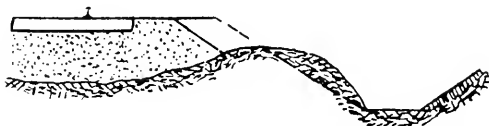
FIG. B—CROSS-SECTION SHOWING DISTORTION OF A CLAY ROADBED.
